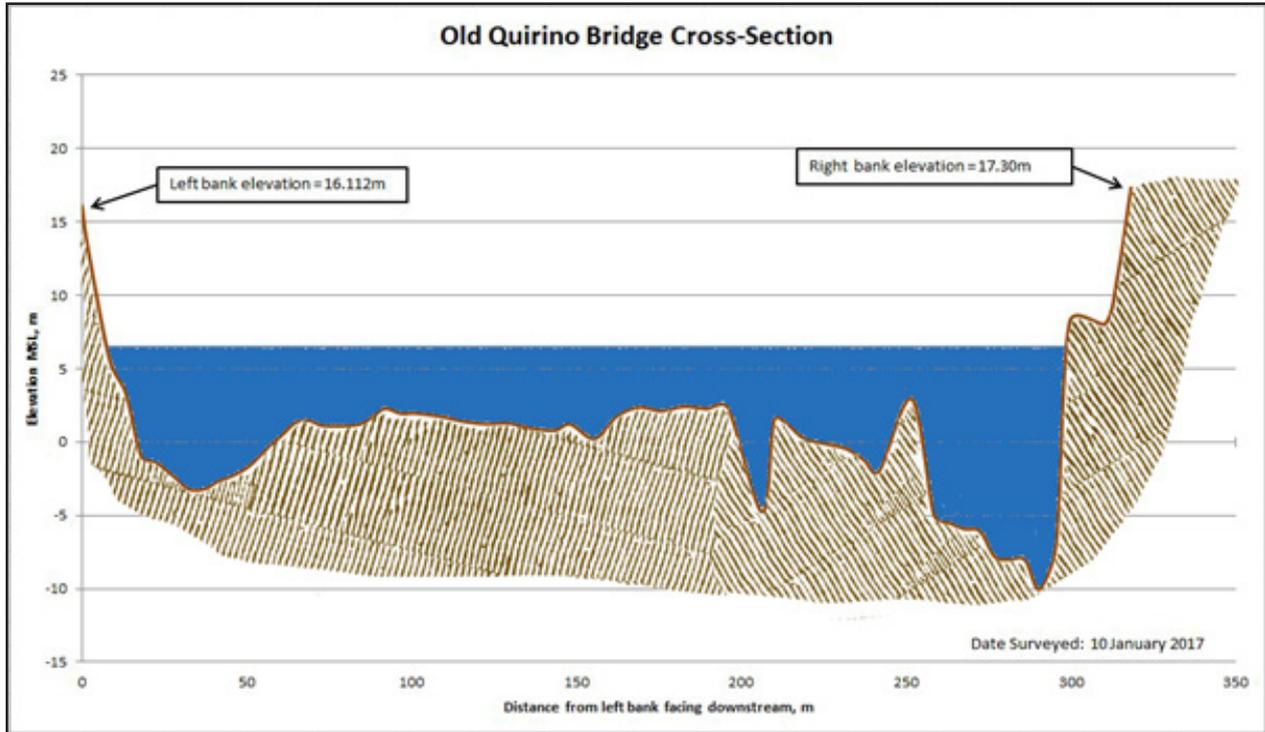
Cross-Section Plot of Banaoang Bridge or Old Quirino Bridge.
